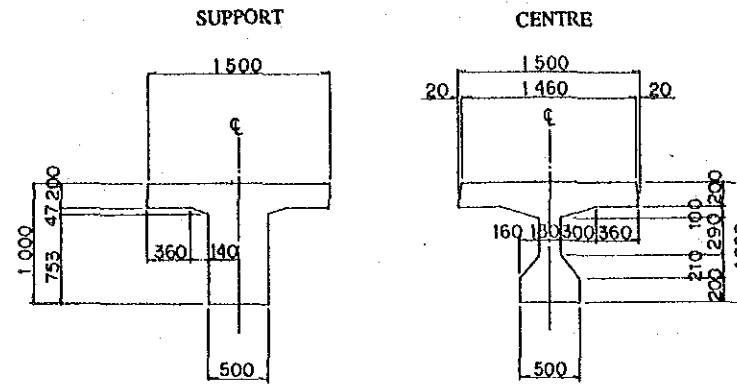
Structural Drawing of Superstructure (Span 24 m)
